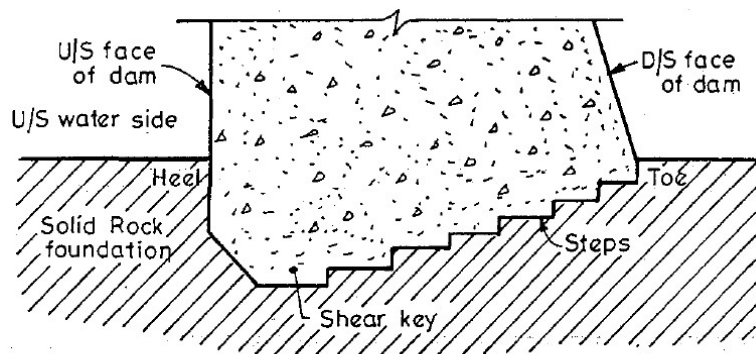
Stepping of dam foundation and provision of shear key.
